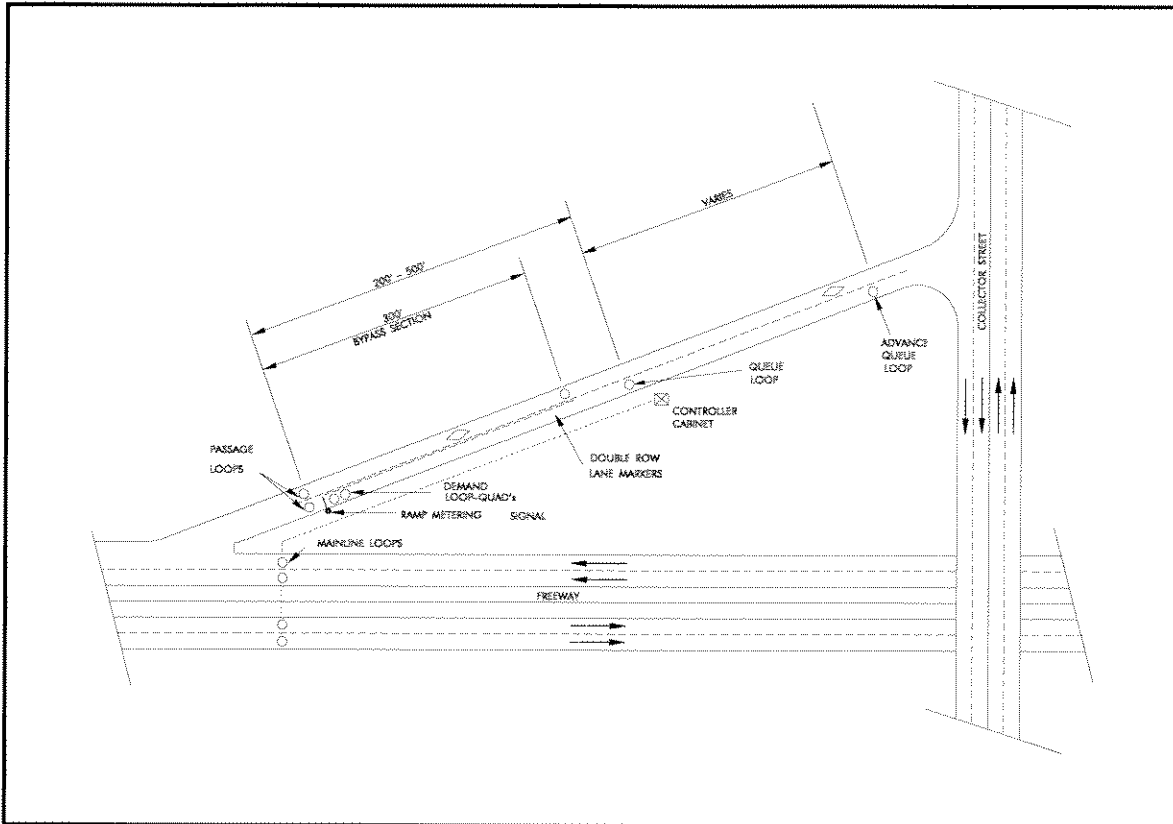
SINGLE LANE METERED RAMP WITH HOV BYPASS
